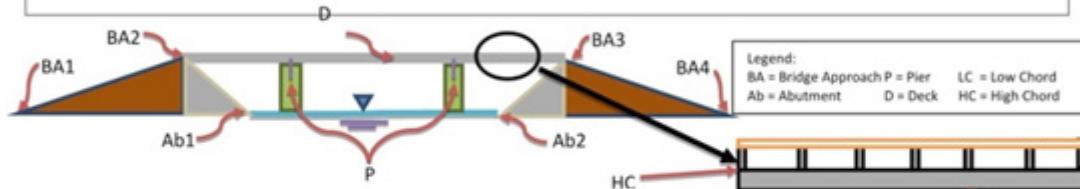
Bridge cross-section diagram of the Mamat-ing Bridge
